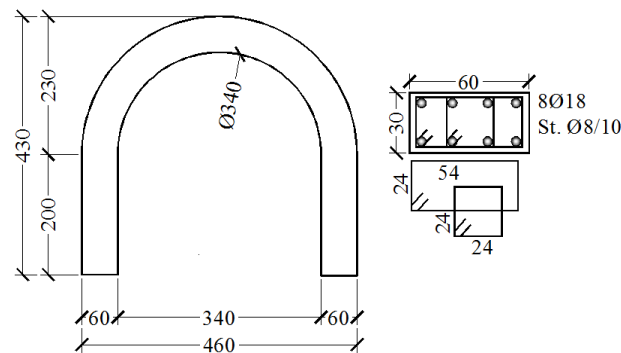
ARCH-SHAPED RC FRAME. GEOMETRICAL AND REINFORCEMENT DETAILS.
